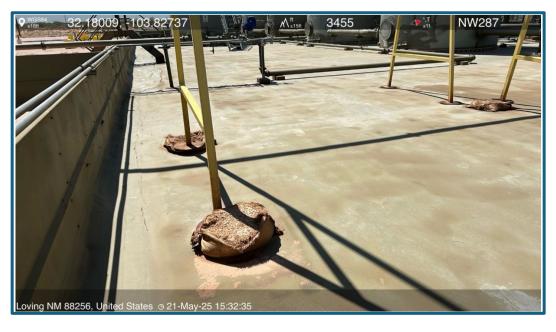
/21/2025	Direction Facing	northwest	Photo 8
